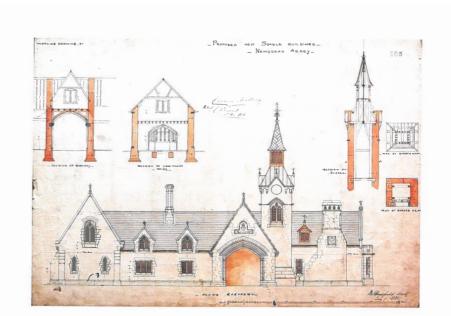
M E Hadfield. 'Proposed new stable buildings - Newstead Abbey - Front Elevation, 1861'. Sheffield Archives (Reproduced by kind permission of Hadfield, Cawkwell, Davidson)
